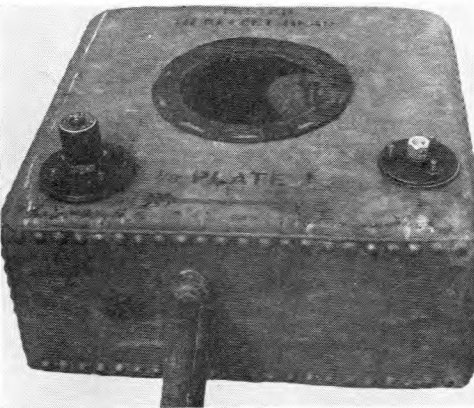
THE IMMERSION HEATER AND THERMOSTAT SHEATH SCREWED INTO THEIR RESPECTIVE FLANGES.
